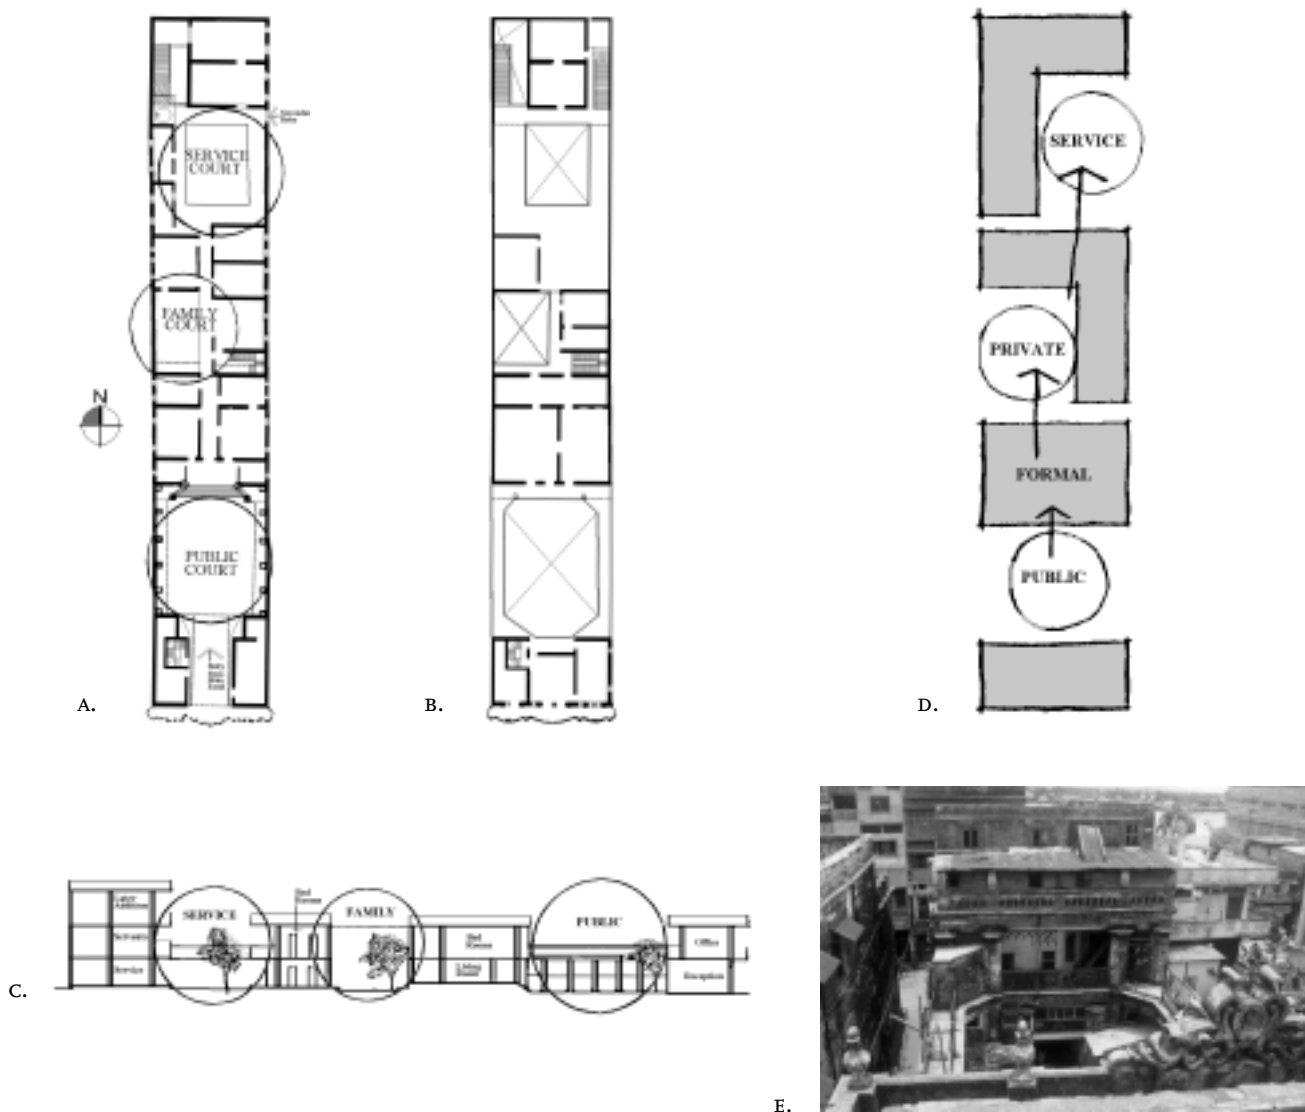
A) ground floor plan. B) second floor plan. C) section. D) articulation of zones. E) photo of formal public court.
